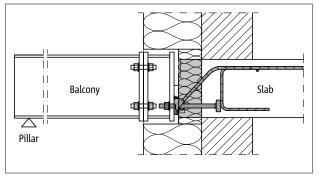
Schöck Isokorb® T type SQ: Connection of the steel member to an adapter that equalises the thickness of the outer insulation
